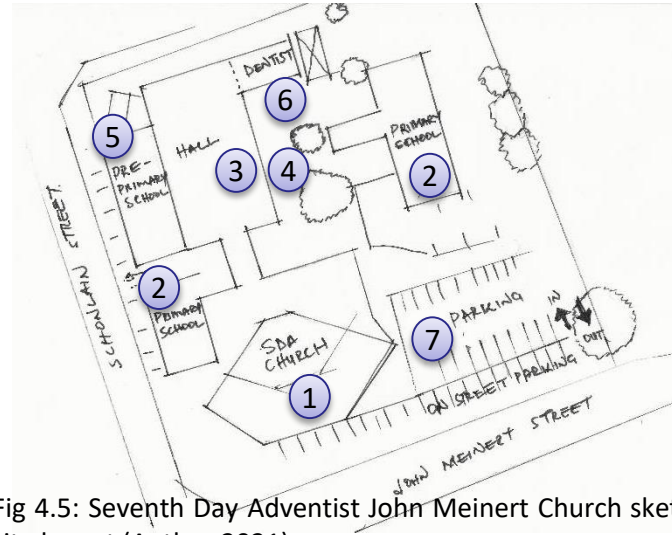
Seventh Day Adventist John Meinert Church sketch site layout (Author 2021).
